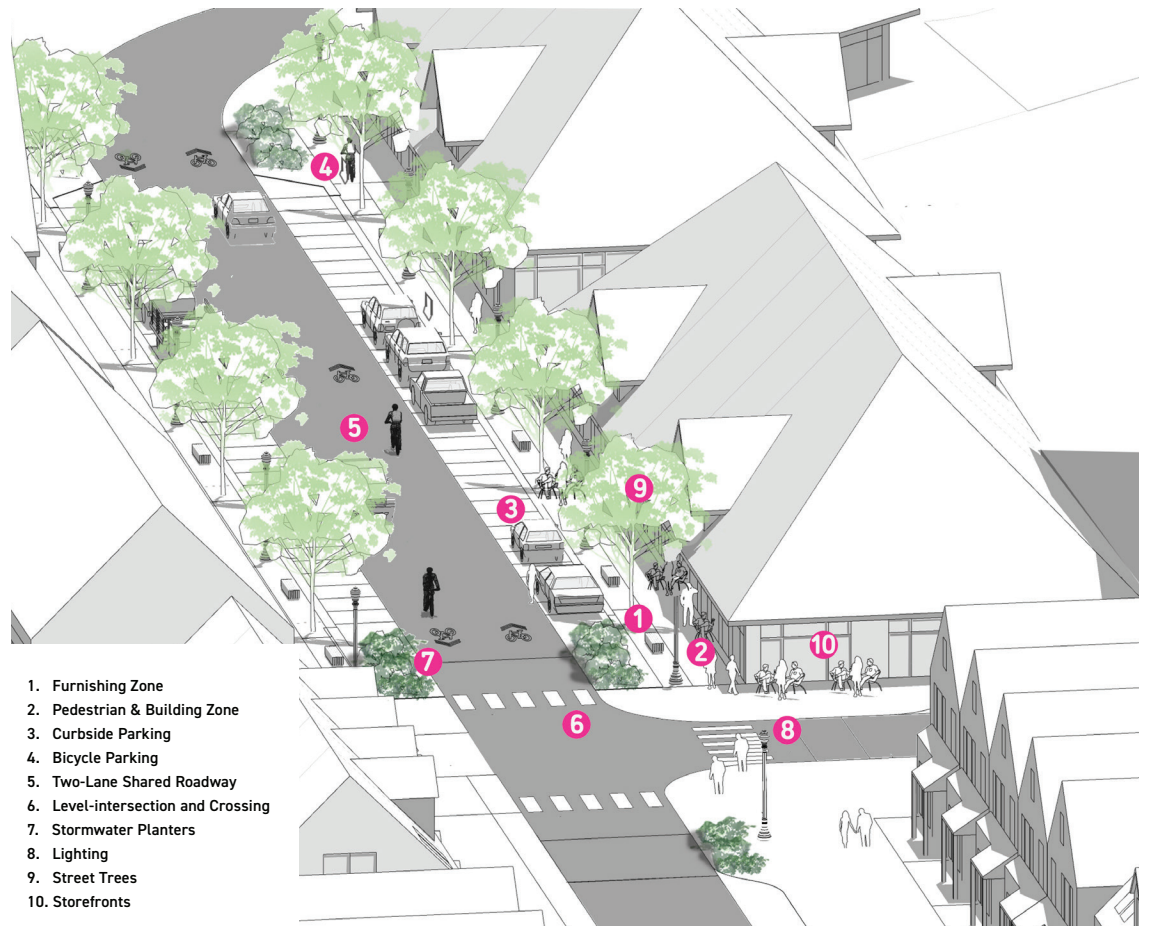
Proposed Complete Street Standard- 60-foot Right-of-way
